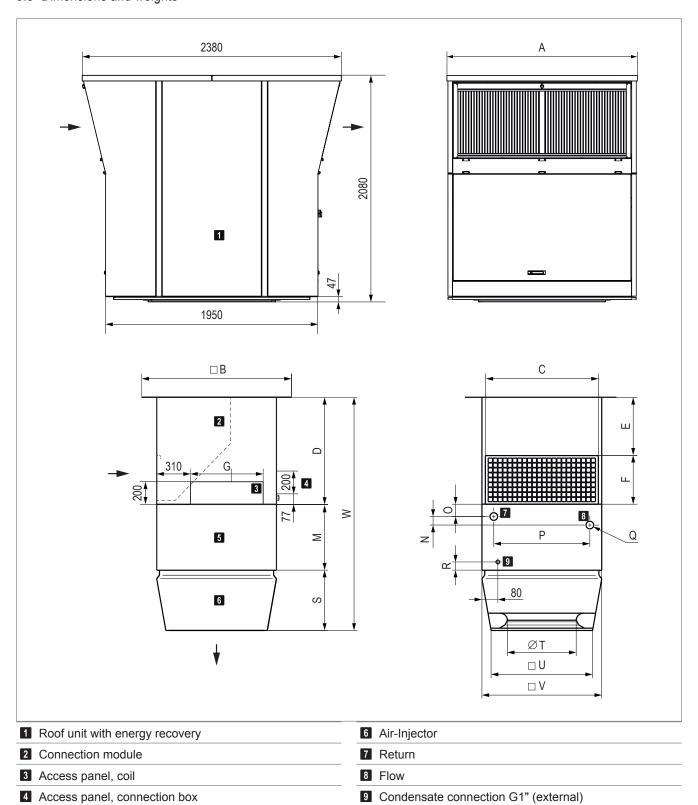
Dimensional drawing for RoofVent® RC (dimensions in mm)
